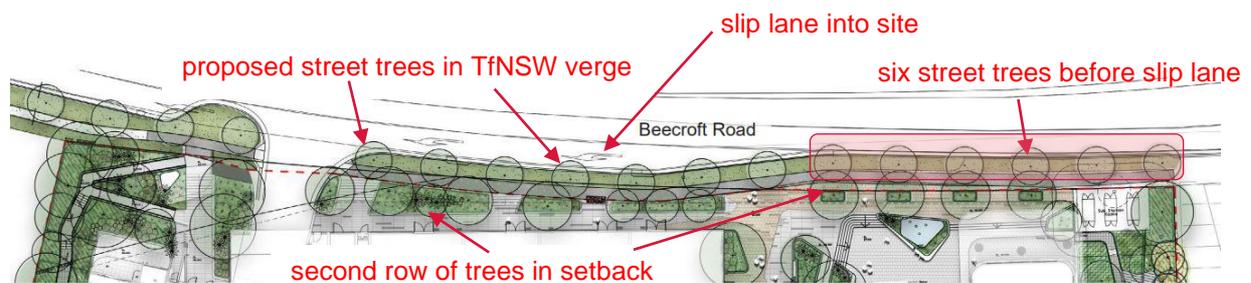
| Proposed rows of tree planting along Beecroft Road (Source: Applicant's RTS)
